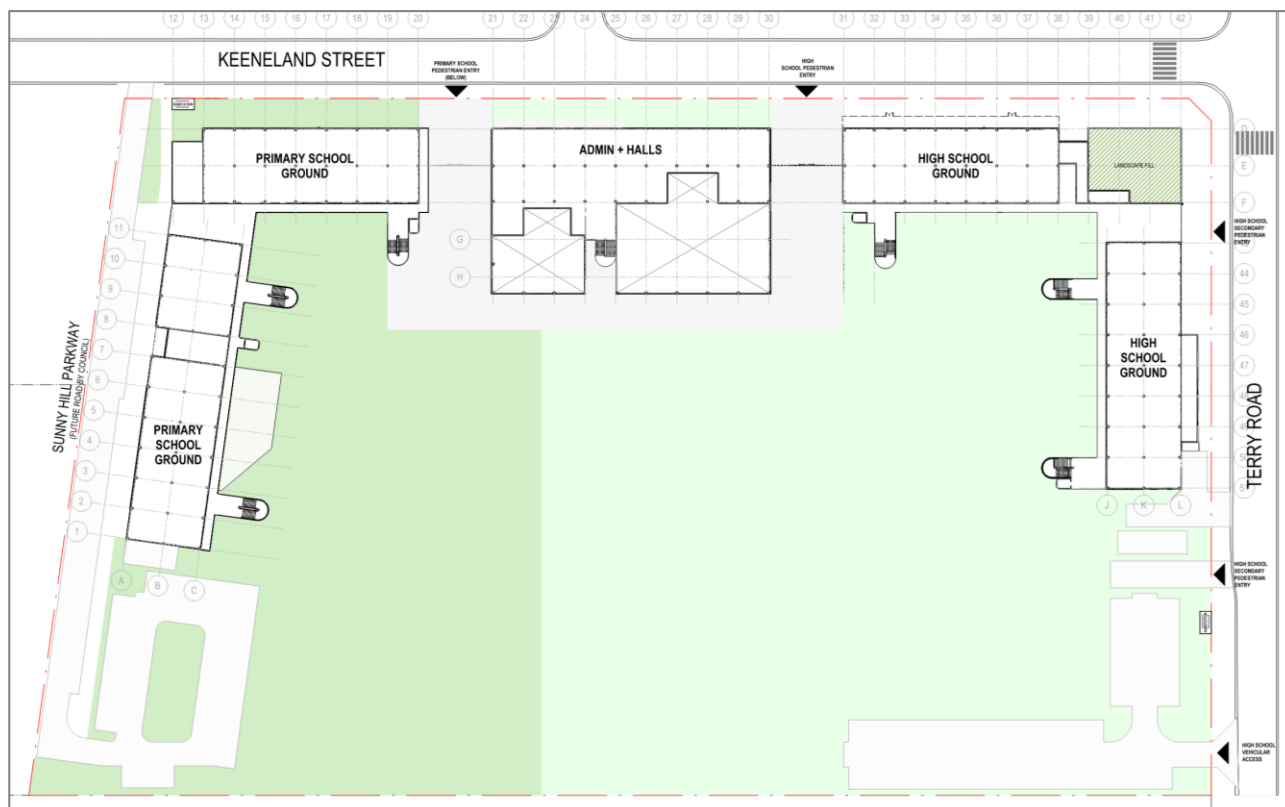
Draft Architectural Ground Floor Plan (Source: Architectus)
